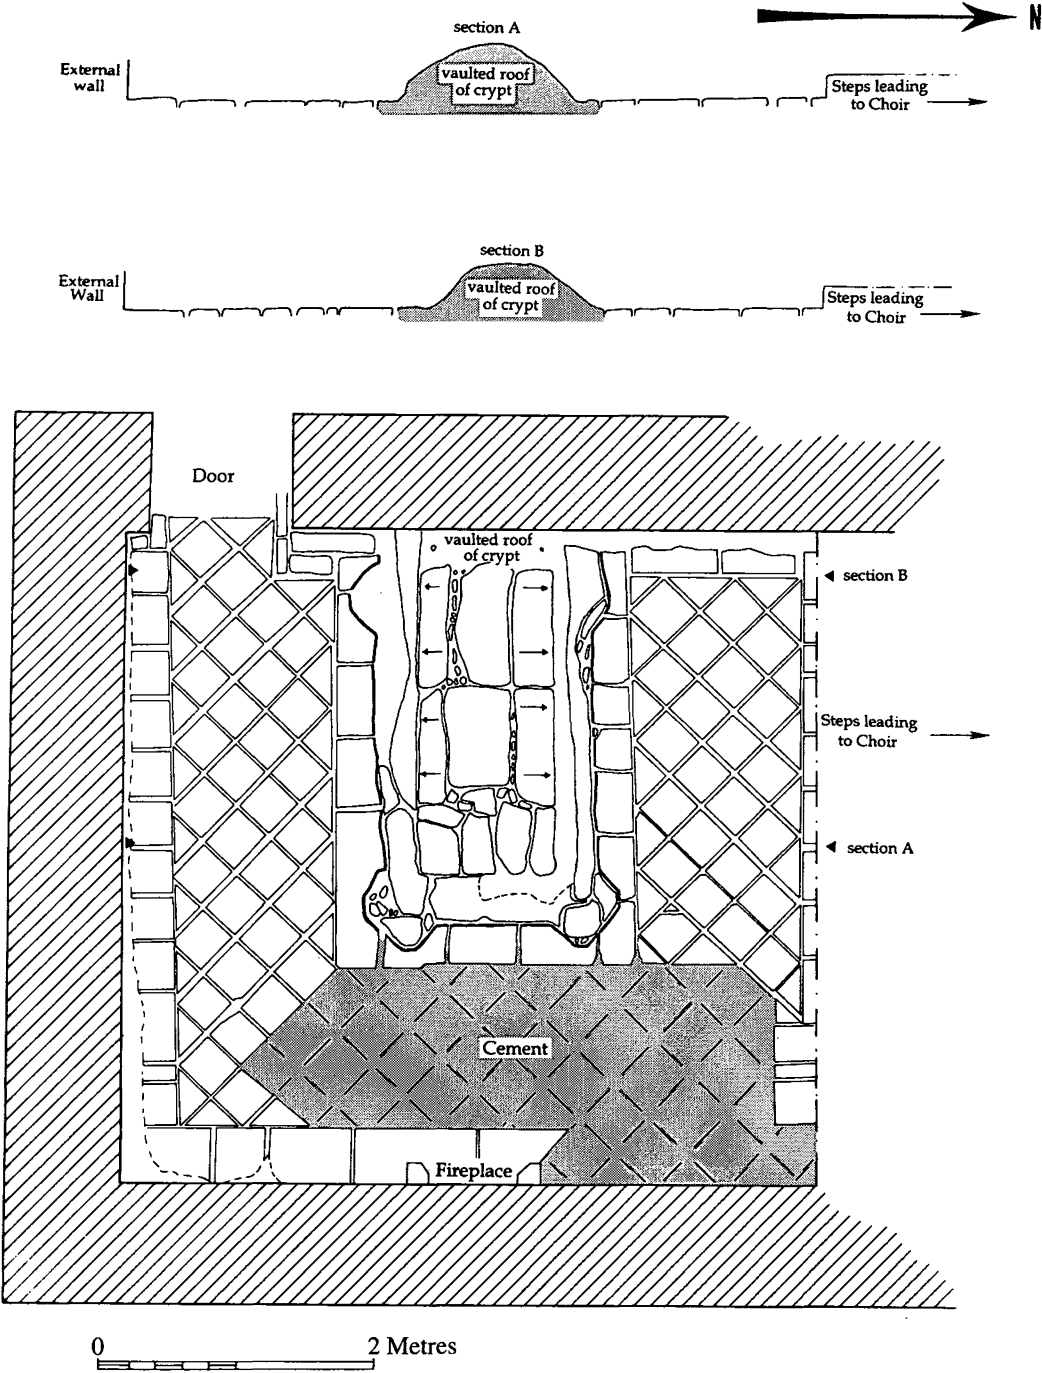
Plan showing detail of floor and location of sections A and B across crypt.
